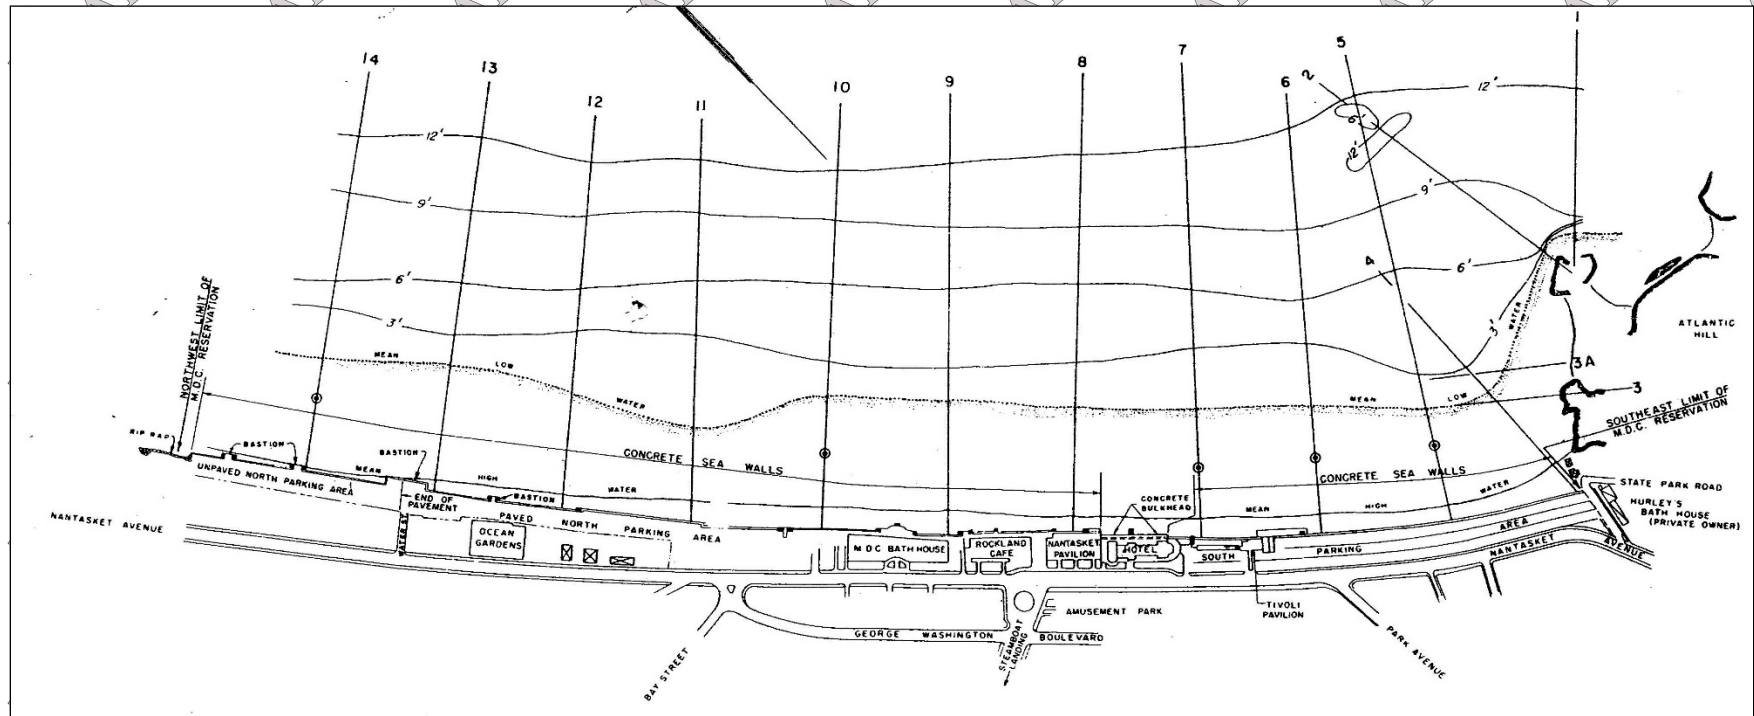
DCR 1949 plan of existing structures at Nantasket Beach (USACE, 1949).
